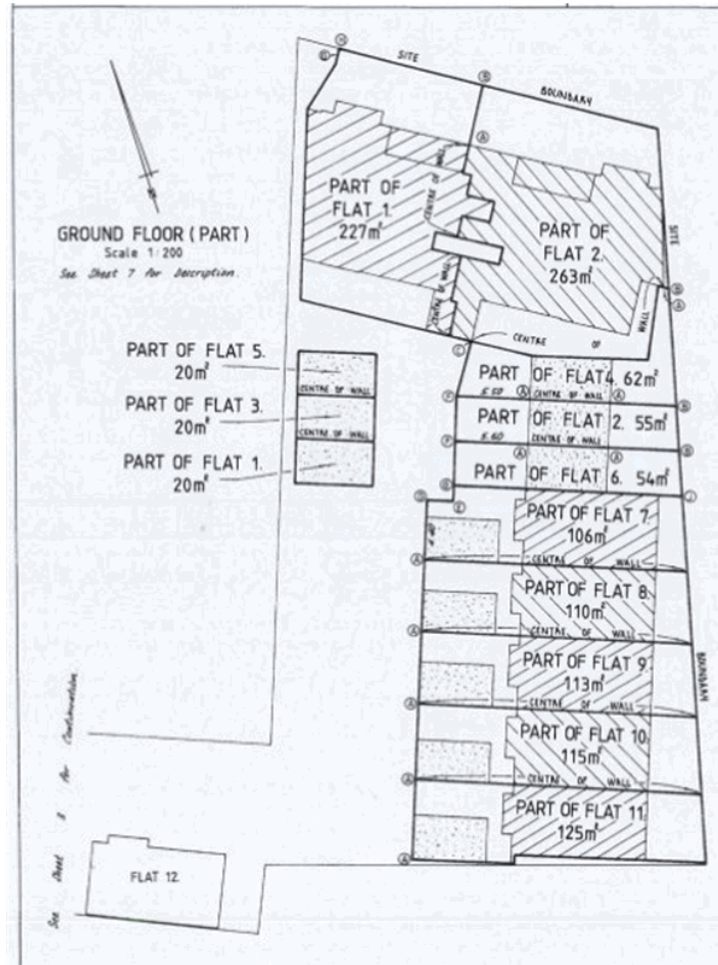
Applicant Site Plan (L Chaplin, 2023)
